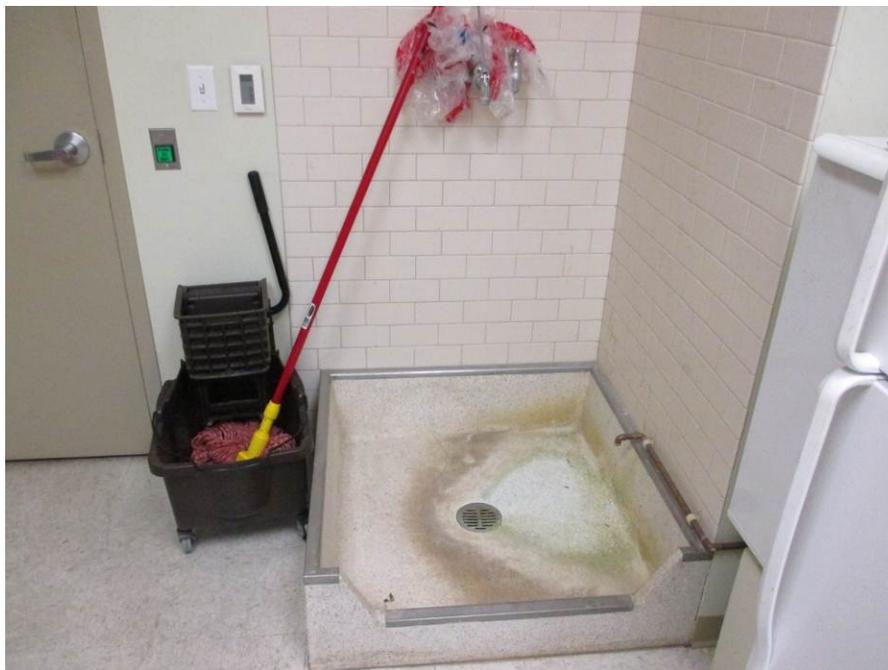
BWQP Mop Sink (for cleaning coolers)
